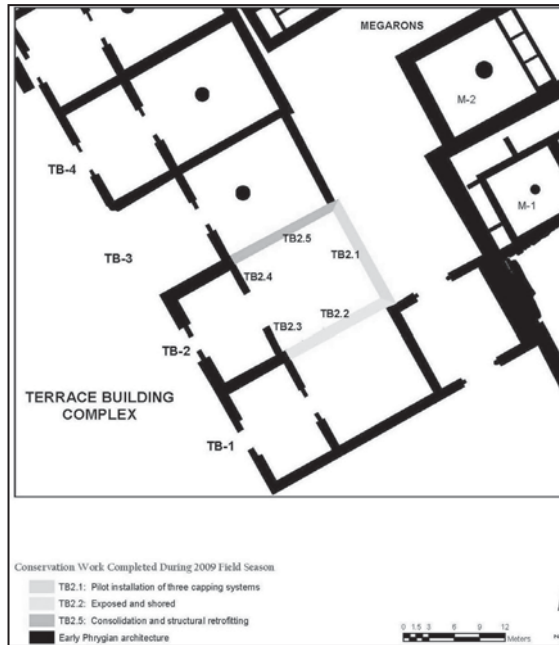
Plan of Early Phrygian Terrace Building 2 and vicinity; interventions conducted in 2009.
